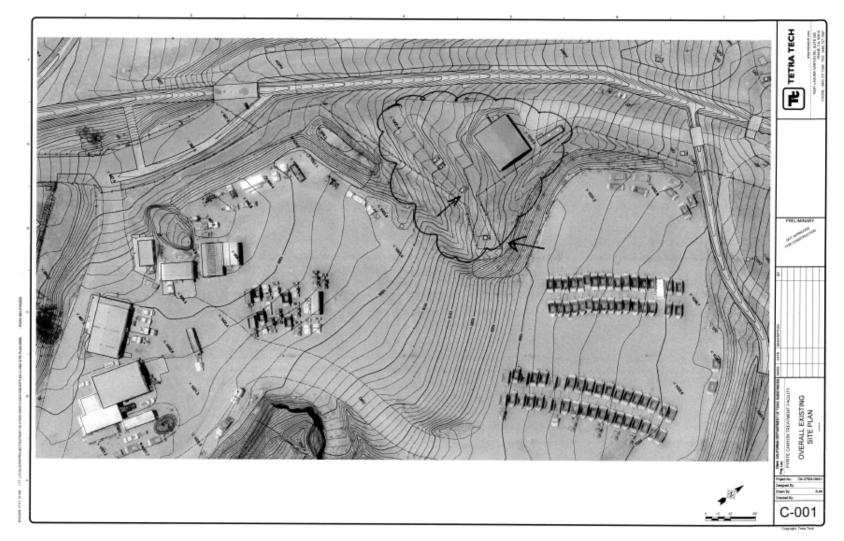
Existing site plan showing topographic contours and proposed PV location in center and east portion of truck parking area Credit: California Department of Toxic Substances Control and Tetra Tech Inc.
